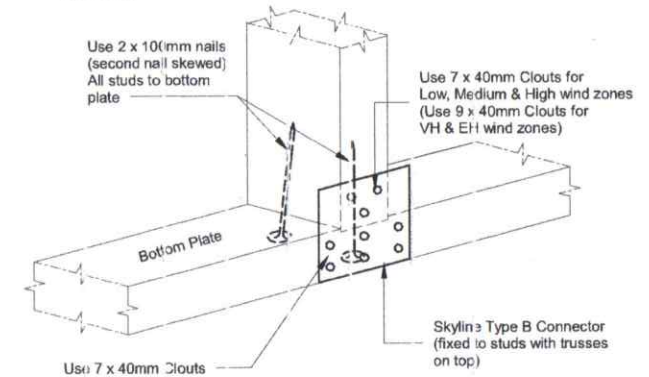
PLATE TO STUD FIXING DETAIL (TYPICAL - Studs without Trusses over)
